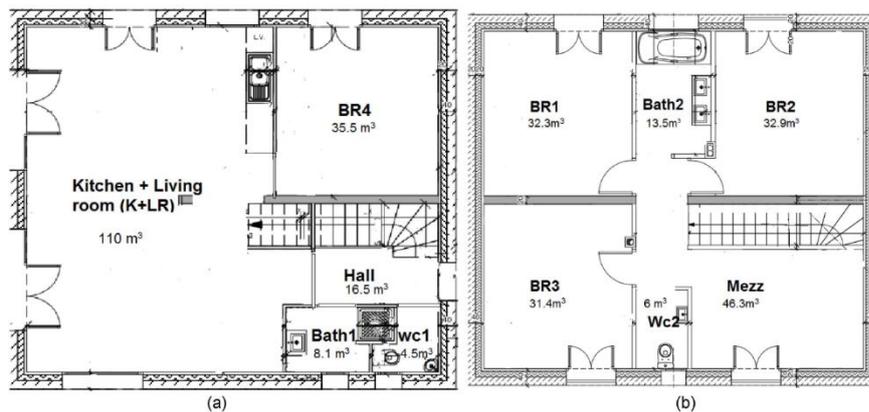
Plan of the house studied: (a) ground floor; (b) first floor (Poirier et al., 2021).
